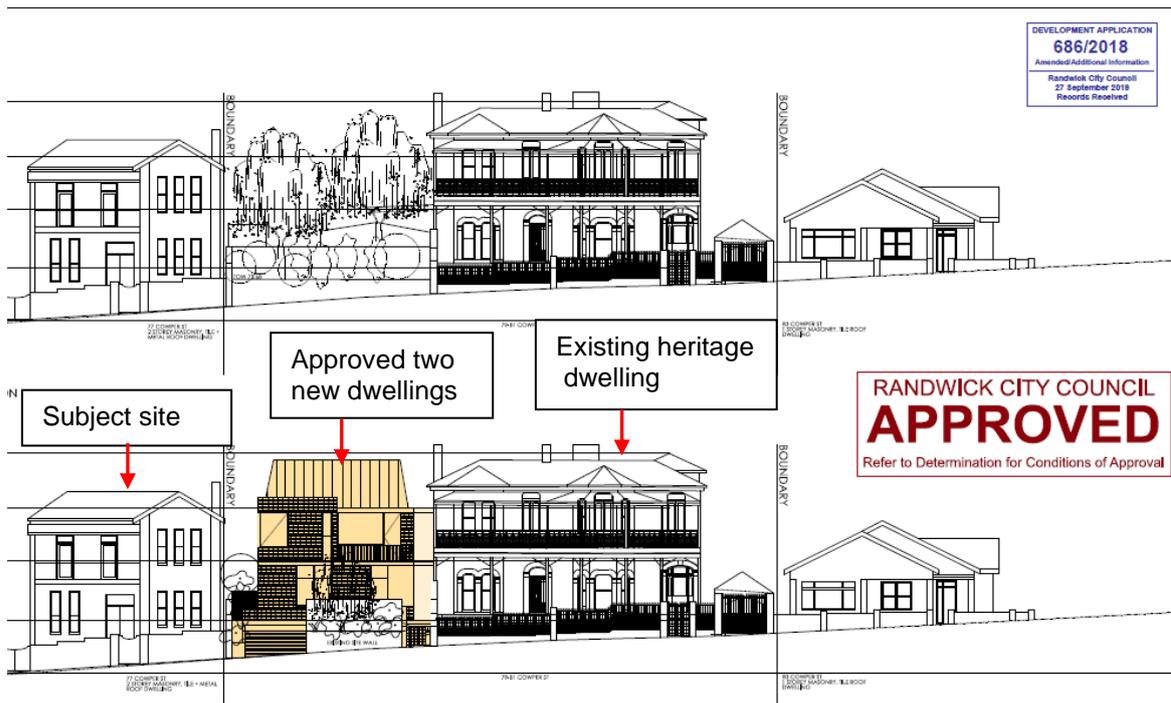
Approved multi-dwelling development at 79-81 Cowper Street (DA686/2018) (existing above and approved below)
